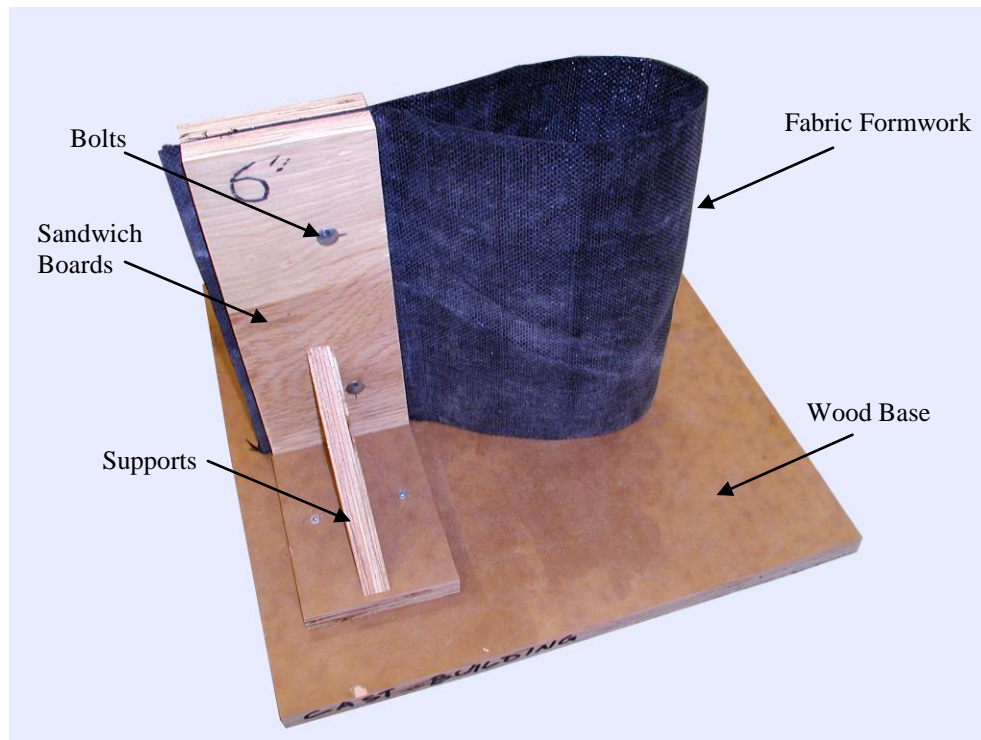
Actual fabric formwork for 152 by 305 mm (6 by 12 in.) concrete cylinders
